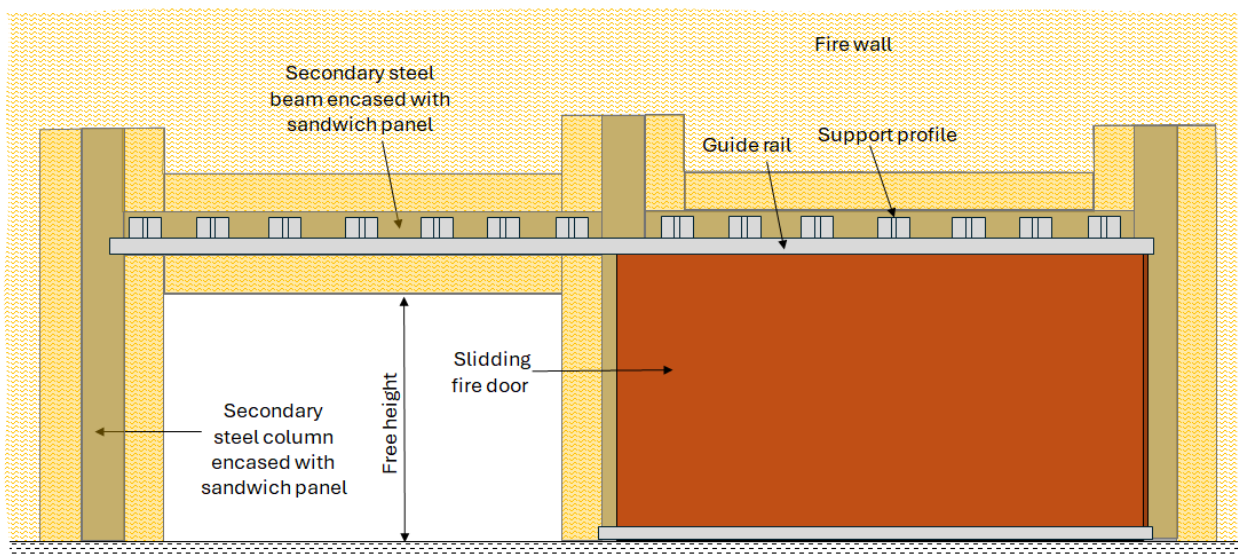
Schematic views of a fire door mounted in a partition fire wall made of sandwich panels - front view
